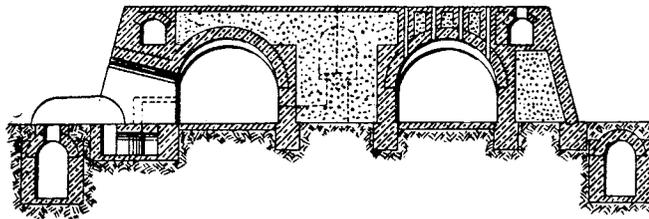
Cross section of modern Hoffman kiln. (After Lovejoy.)
